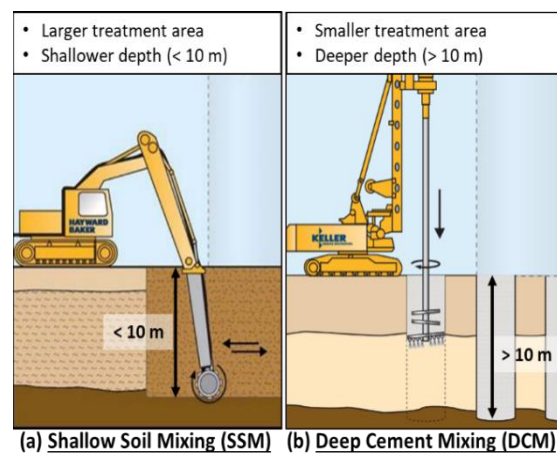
Schematic illustration for Shallow Soil Mixing (SSM) and Deep Cement Mixing (DCM) [4].
